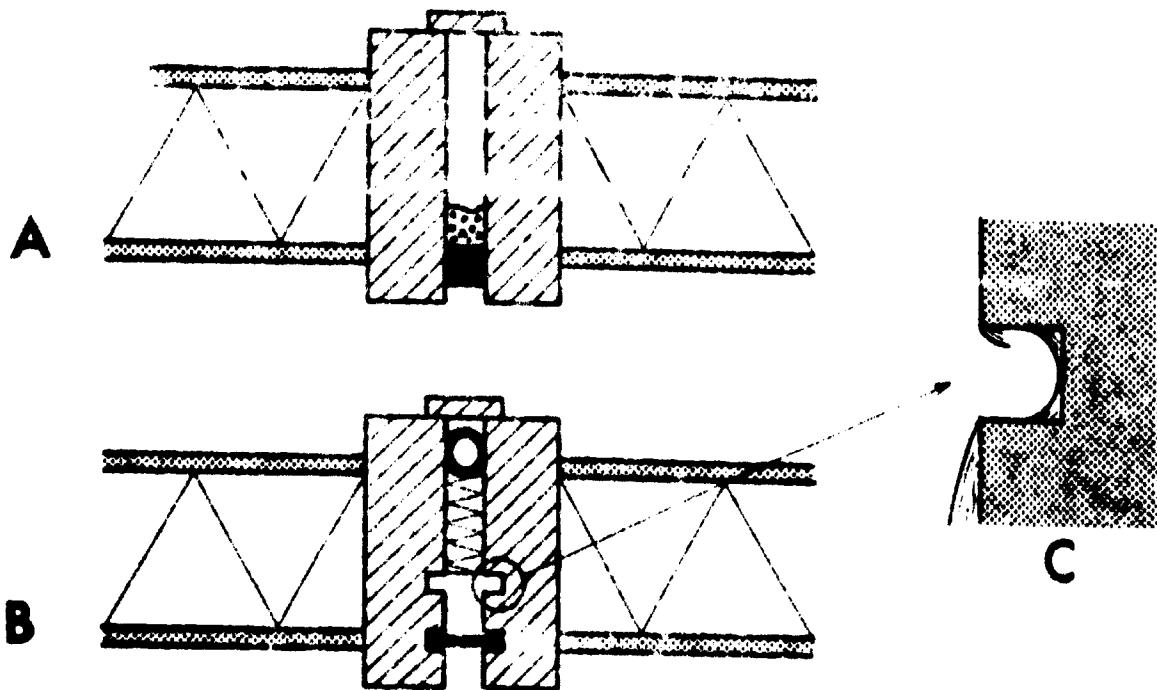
Figure K. One- and Two-Stage Joints in Wood-Framed Facades
